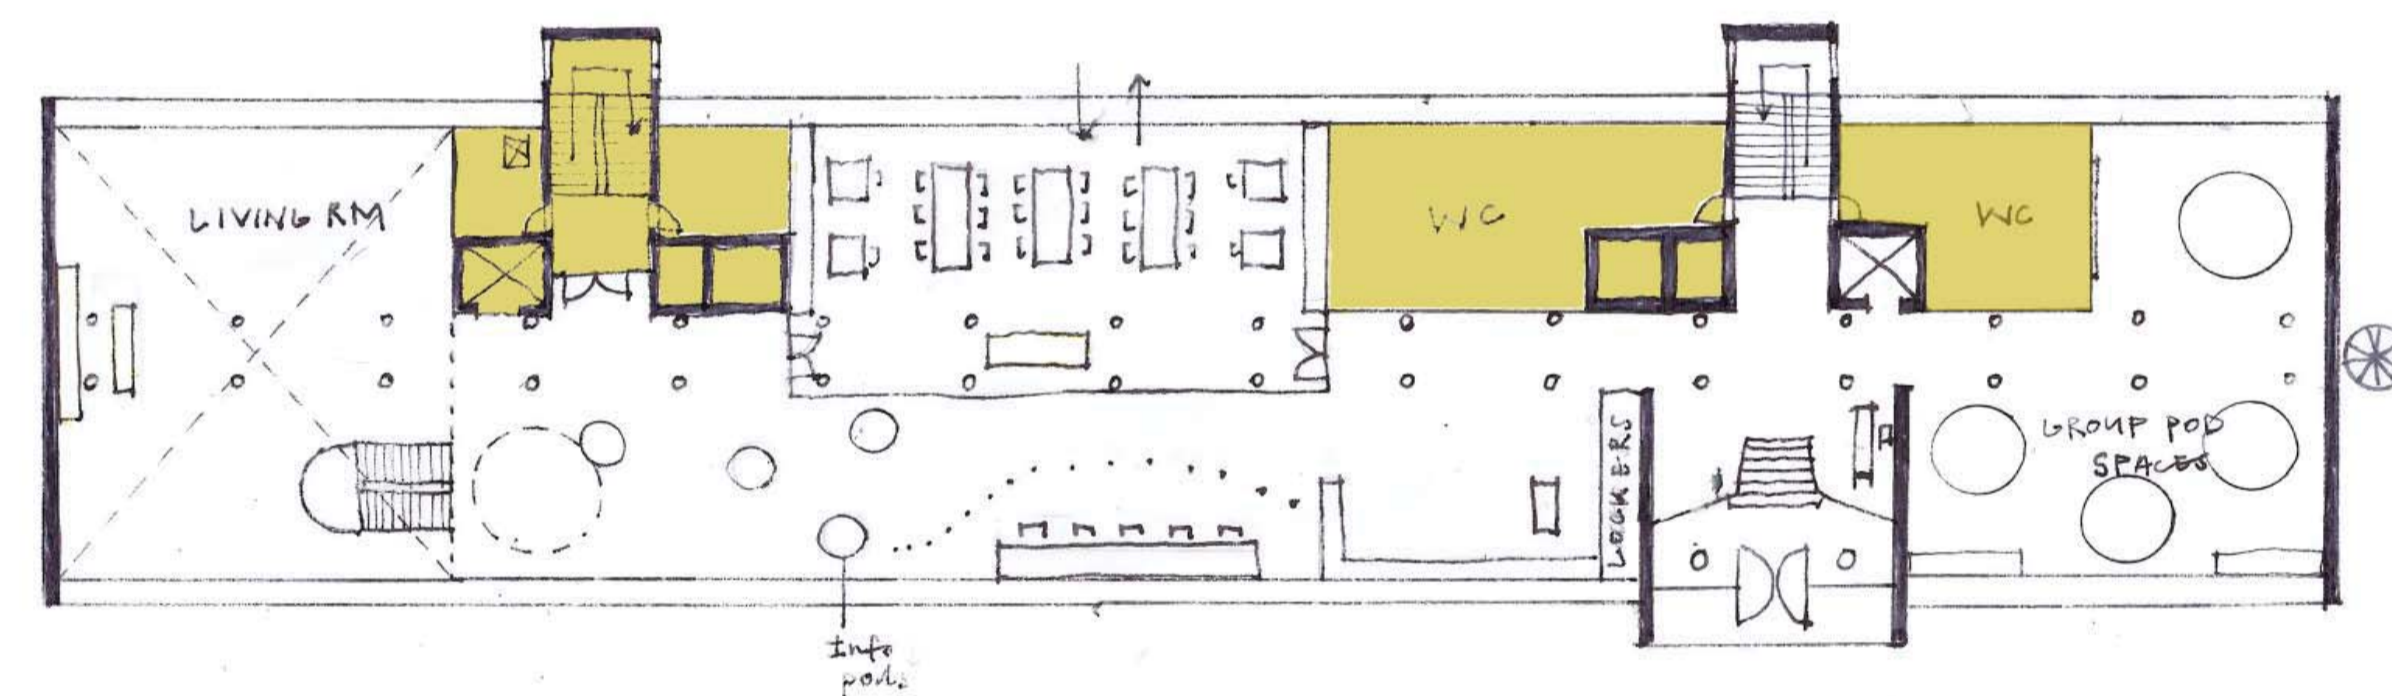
UPPER GROUND FLOOR ZONING PLAN
